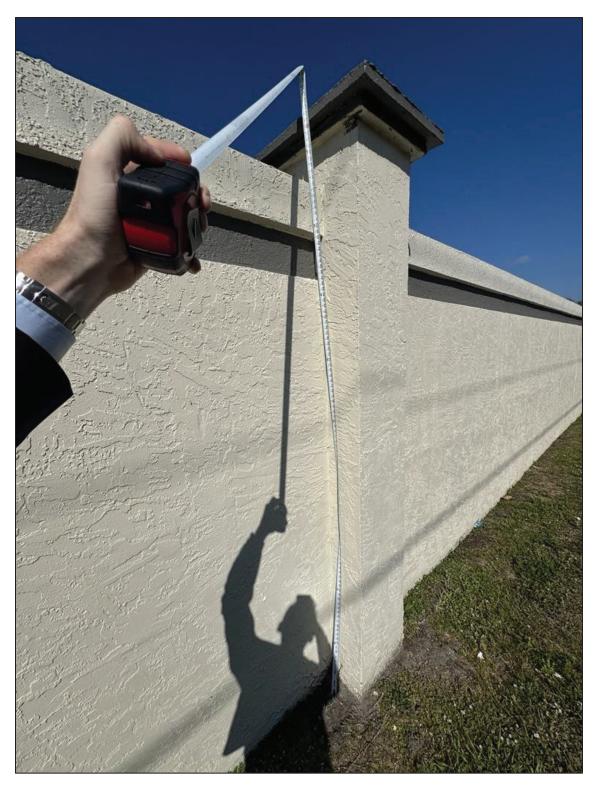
9'-6" Wall Section at Property 8806 Bayaud Dr, Tampa
